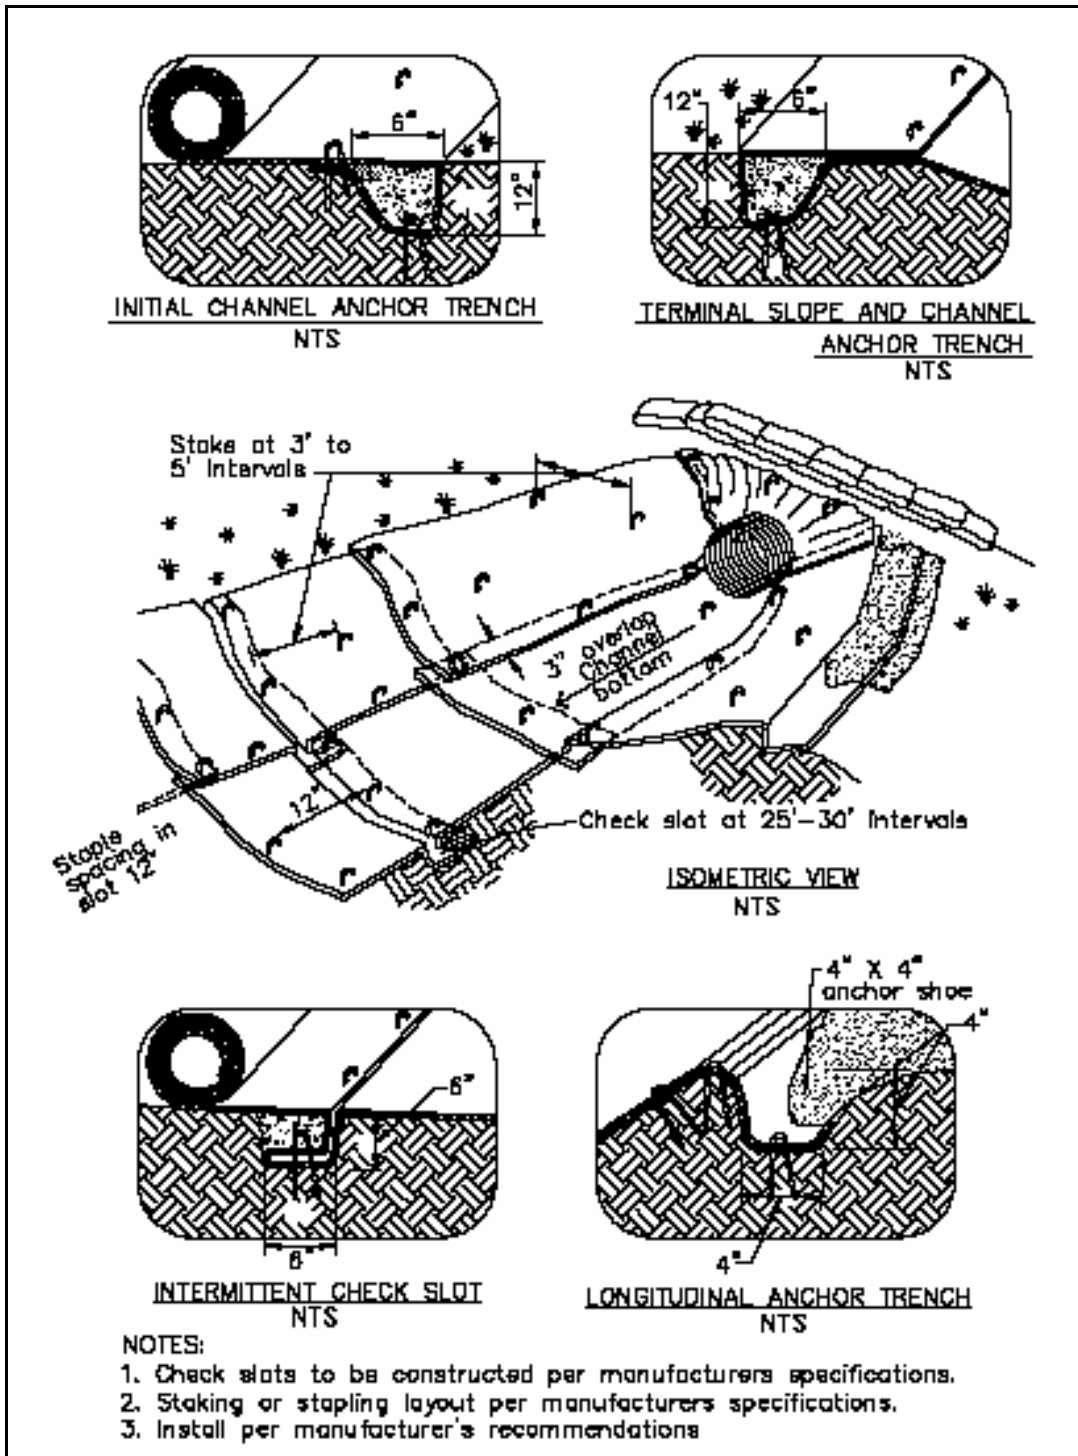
TYPICAL INSTALLATION DETAIL
